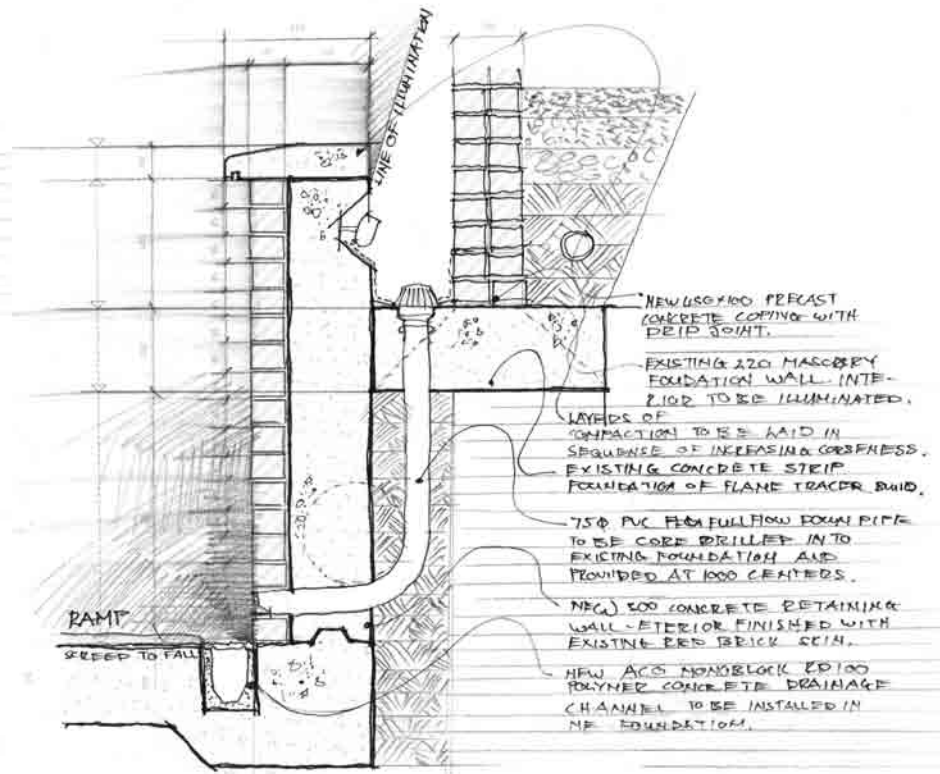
New ramp detail illumination the existing weathered interior walls, nts (Author, 2011)
